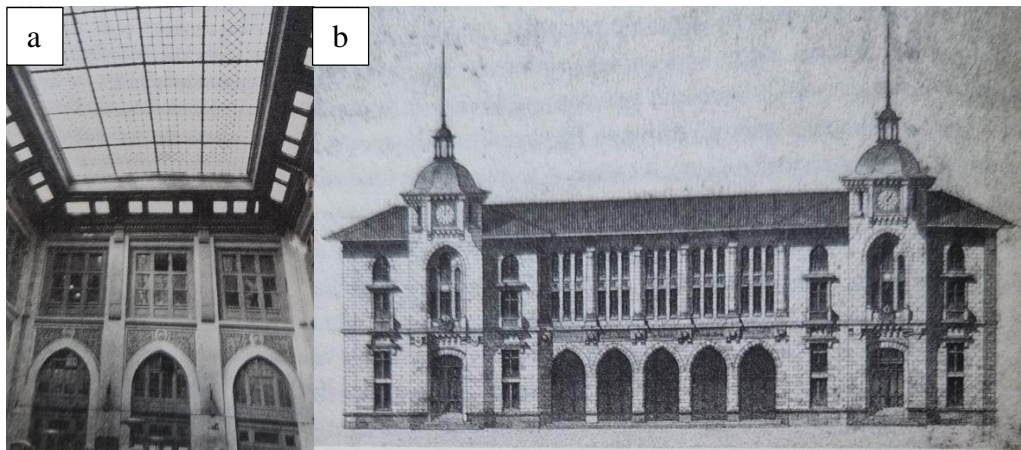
Sirkeci Central Post Office by Vedat Tek in 1909. a: Interior of the building and the glass roof. b: The front façade of the building (Bozdoğan, S., 2001, p:38)
